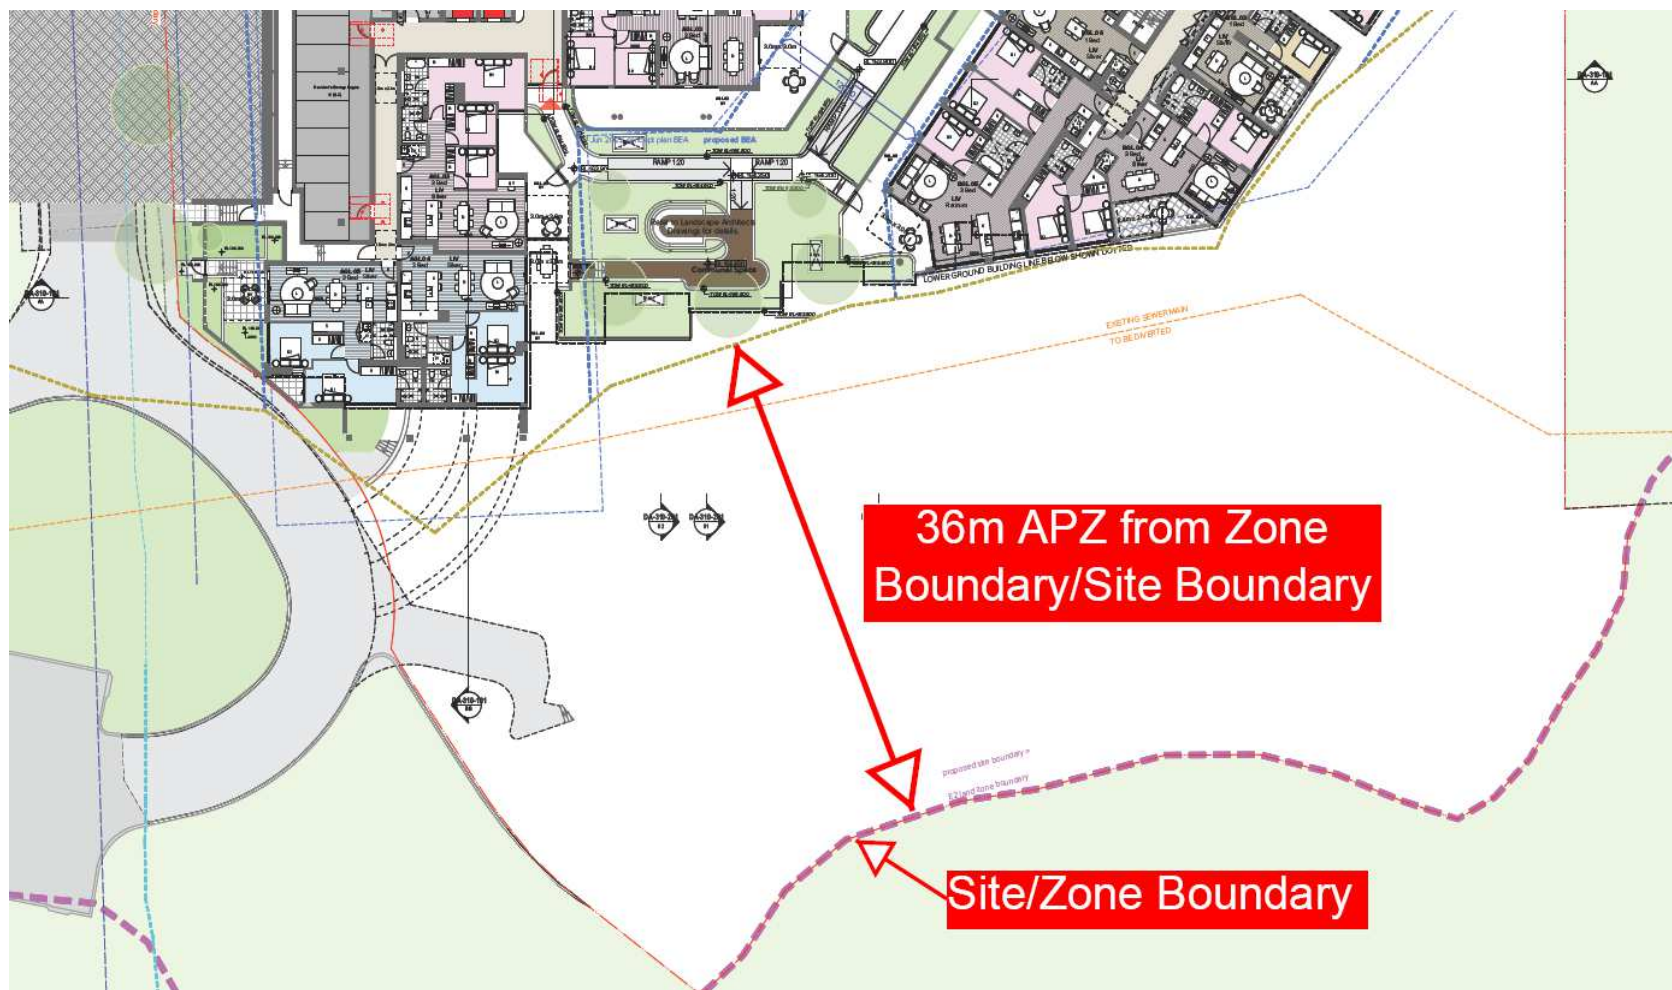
Plan of Asset Protection Zone – Ground Floor.
